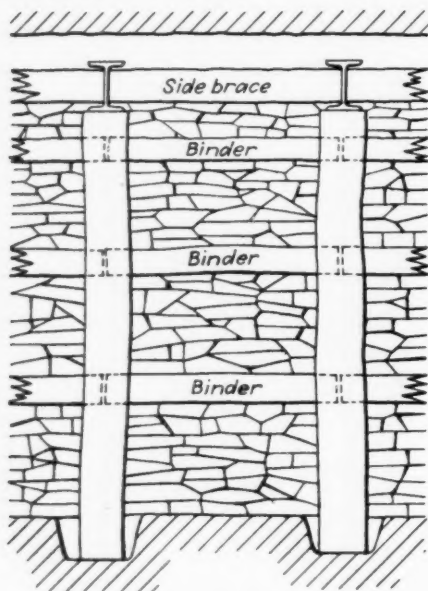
Typical example of walling between legs and installing auxiliary binders
